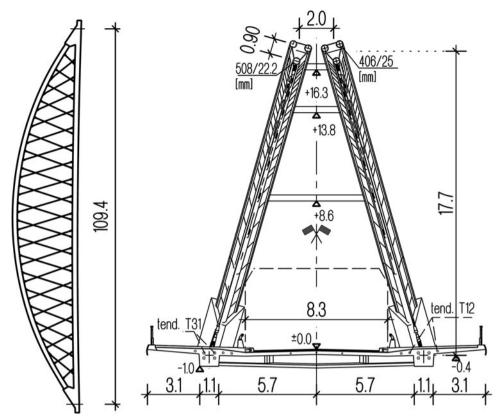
Geometry overview and the cross-sectional details of the bridge under consideration.
